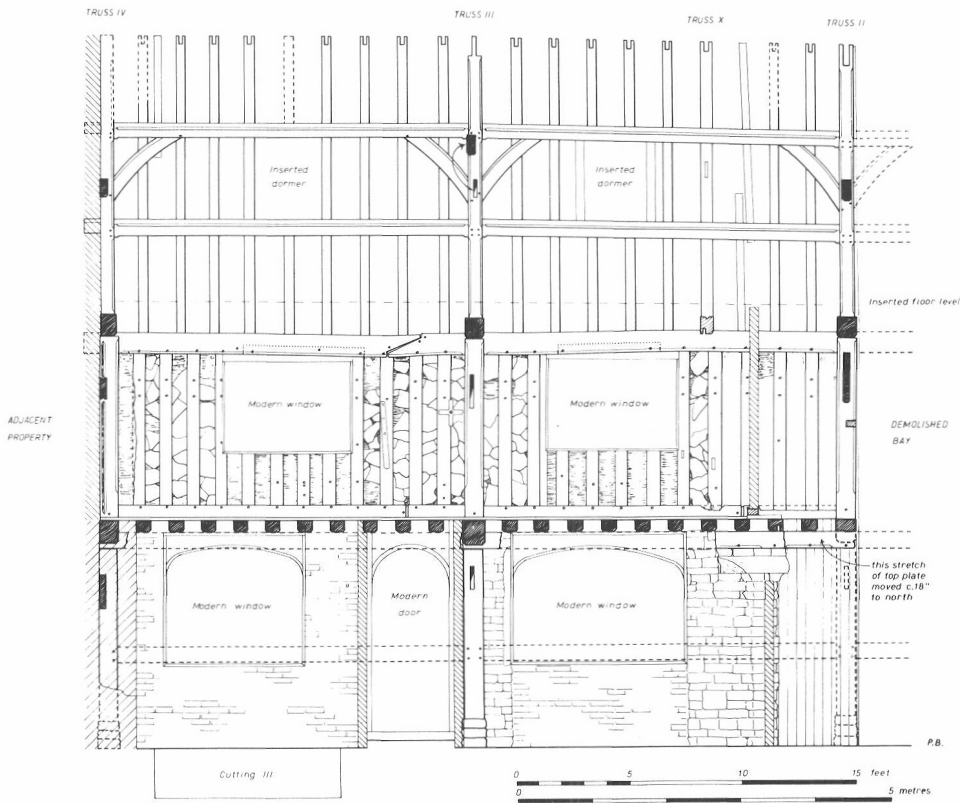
The Peacock Inn: the timber-framed building—interior elevation of south wall
